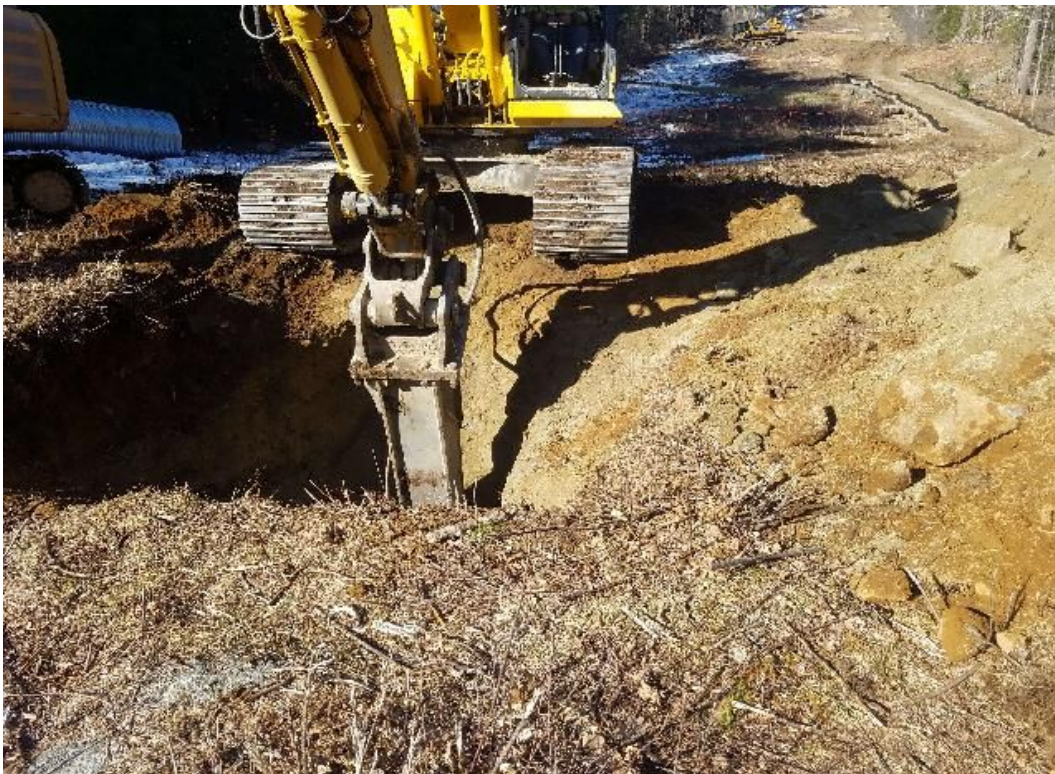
hammering ledge at Str. 76. Viewing west. (03-27-20).
